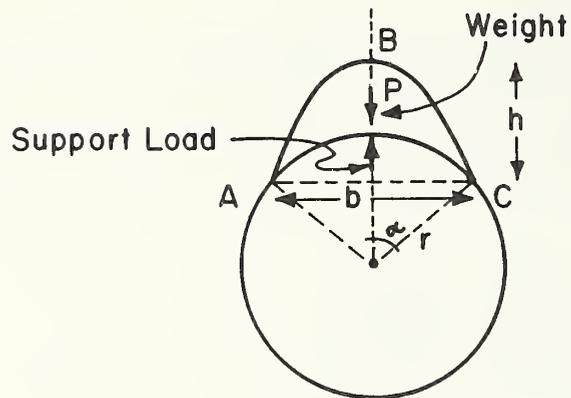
RITTER'S (1879) METHOD : CIRCULAR TUNNELS
